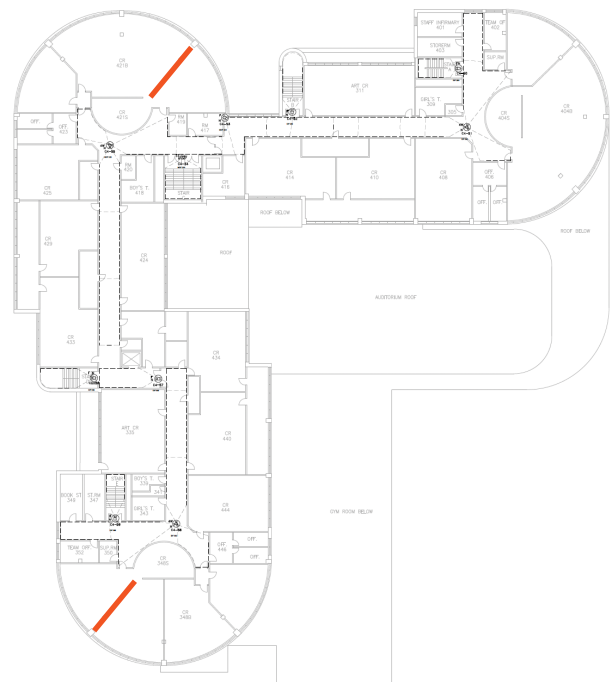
I.S. 131 Floor Plans - 3rd Floor, Alterations shown in orange
